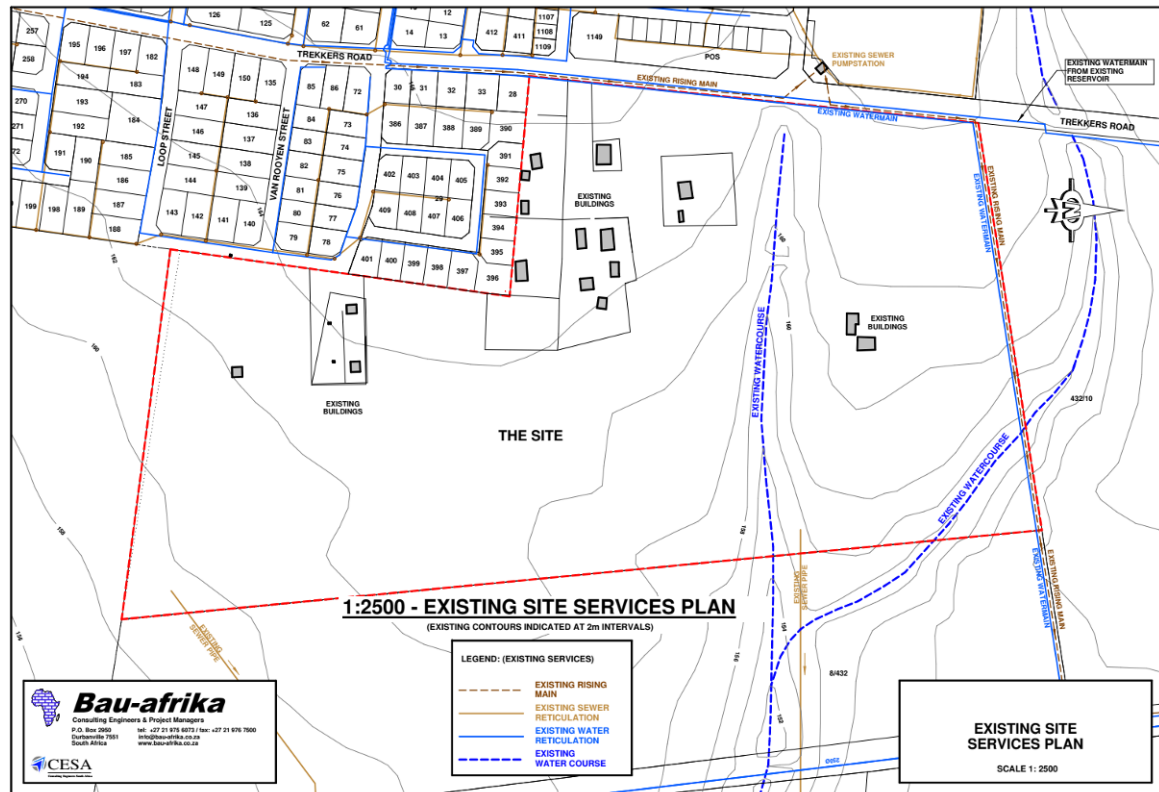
Existing Services Plan (Source: Bau-afrika 2019)
